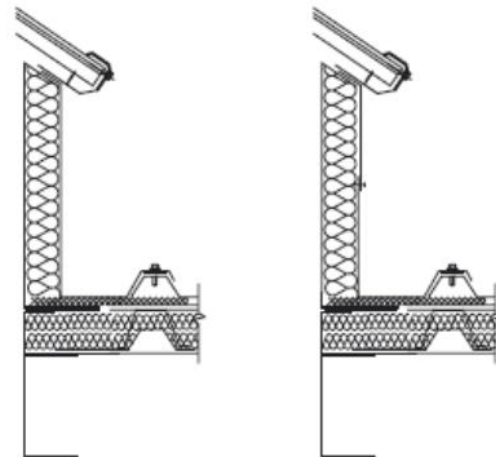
Installation of steel base on the system roofing steel structure with aluminium flashings.
